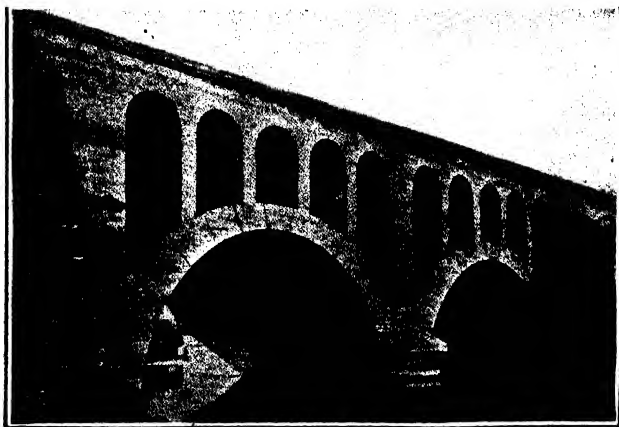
Angola bridge, L. S. & M. S. R. R.
